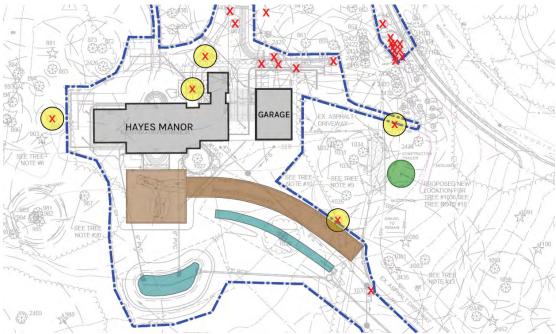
Revised site plan showing the new turnaround and bioretention area.
